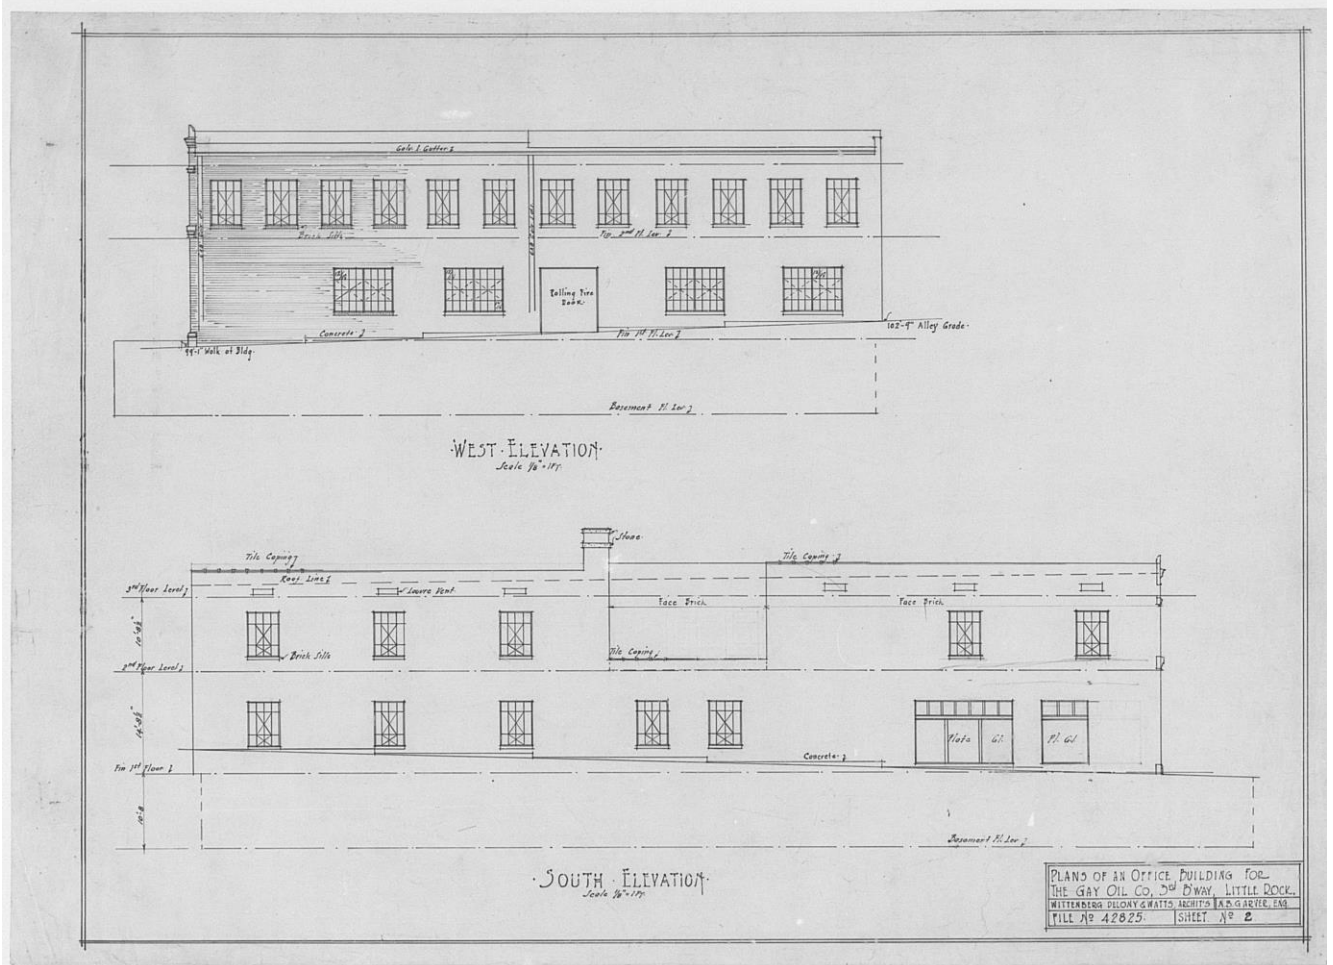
South and West Elevation Drawings for the Gay Oil Company Building
